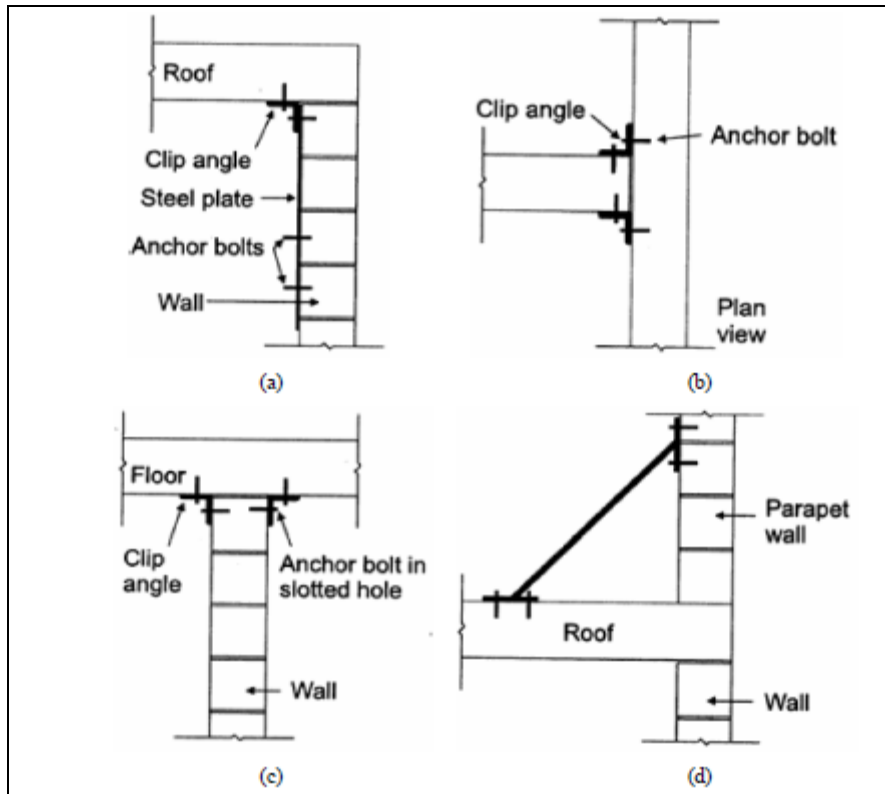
Tying and anchoring masonry walls, (a) hold down of roof (b) intersecting walls (c) floor to wall (d) bracing parapet (Korany, 2011)
